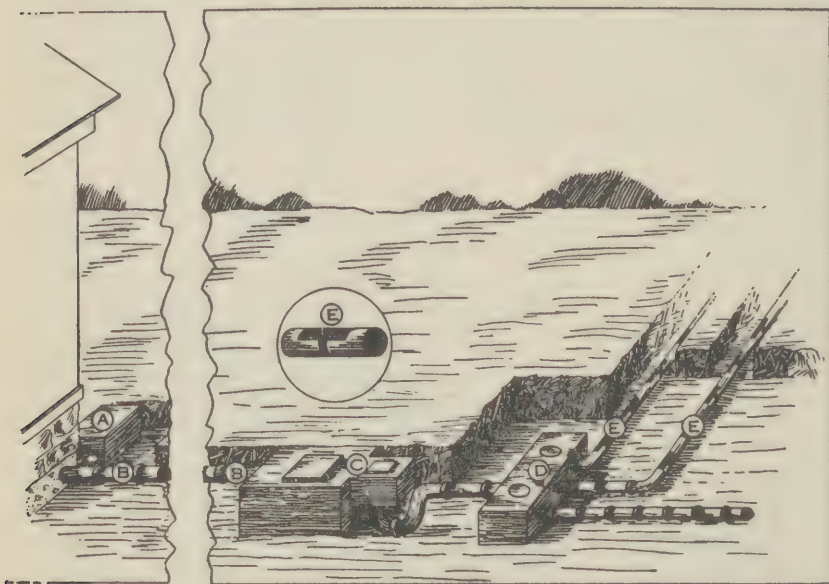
Typical small septic tank installation (Schematic). A—Grease trap. B—House sewer. C—Septic tank. D—Distribution box. E—Tile lines showing method of protecting space between tiles.
